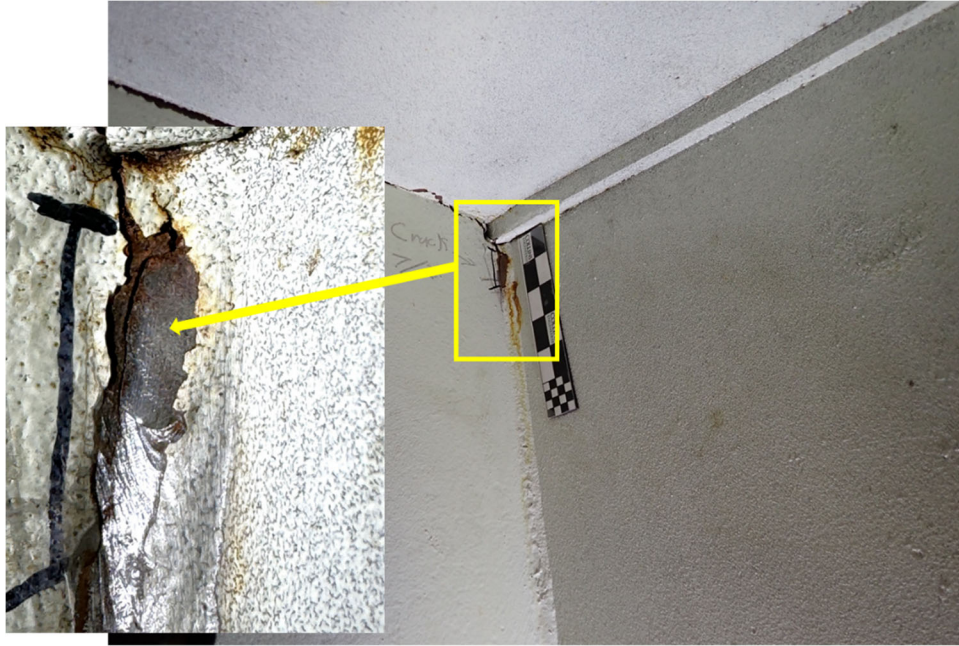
Photograph of crack observed at interior diaphragm of pier 6 cross girder
